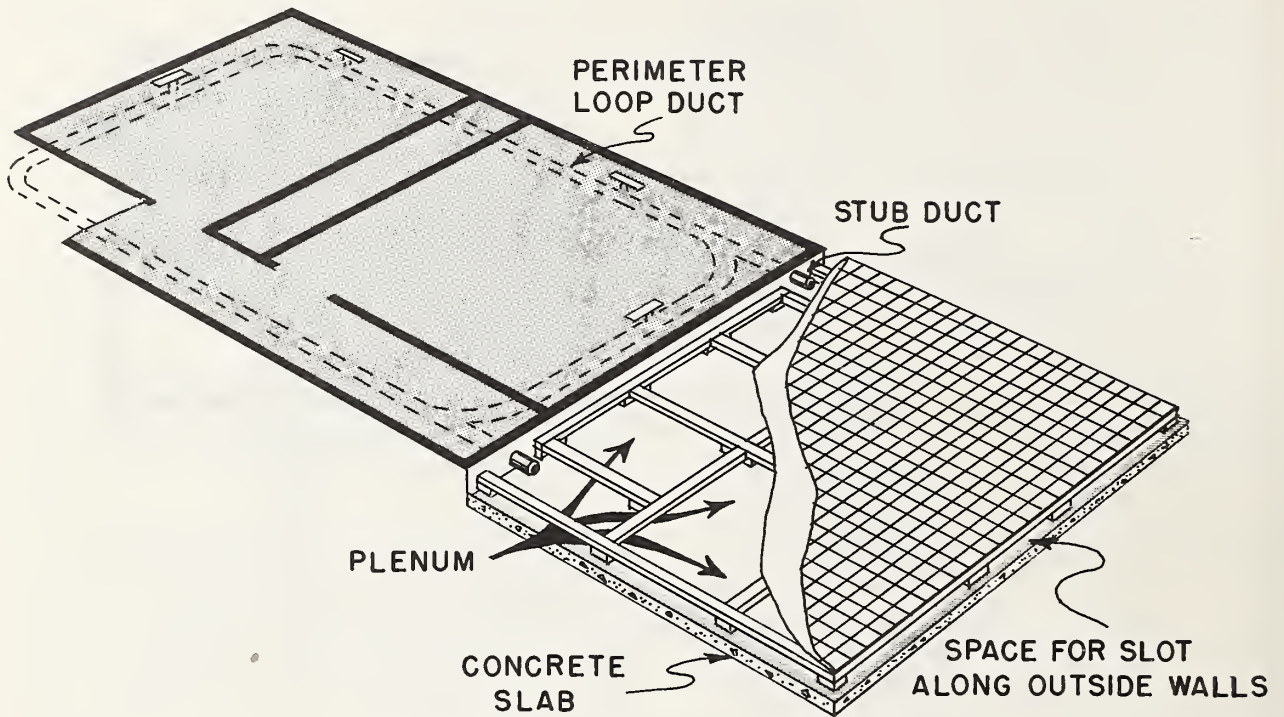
Schematic of perimeter-loop ducting and underfloor plenum in house D.
